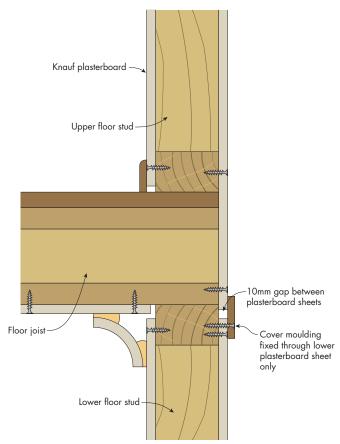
Horizontal Control Joint at Mid-floor Section
